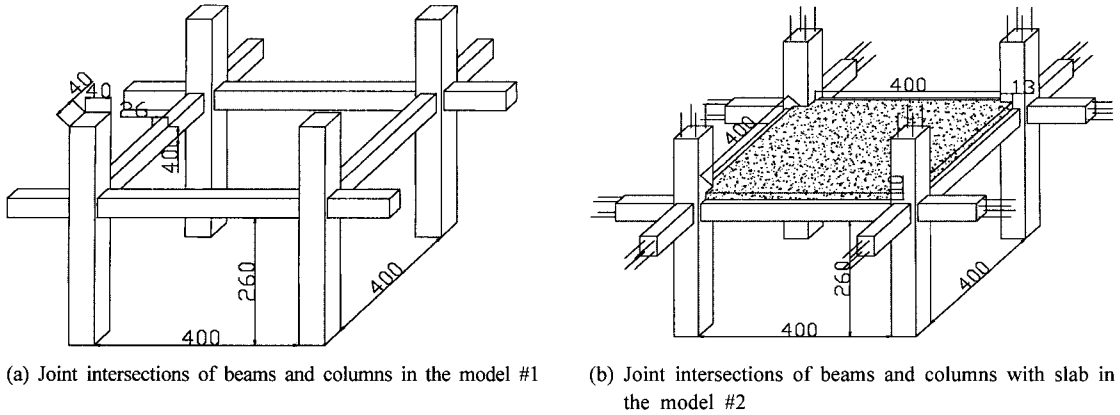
Detailed drawing of joints for scaled model structure (unit: mm)
